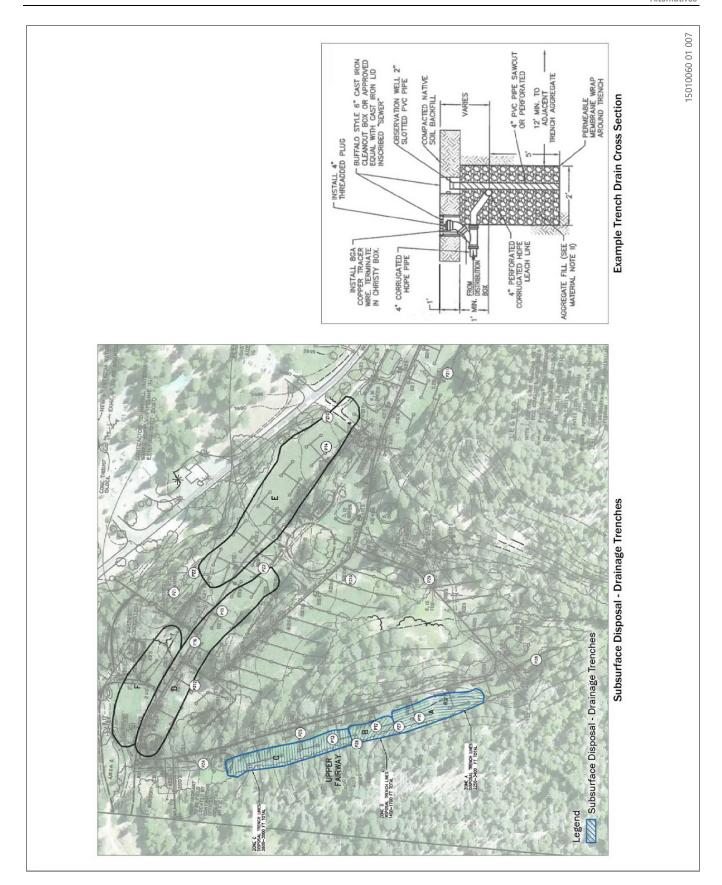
Alternative 2 Big Trees Lodge Golf Course Disposal: Drainage Trenches
